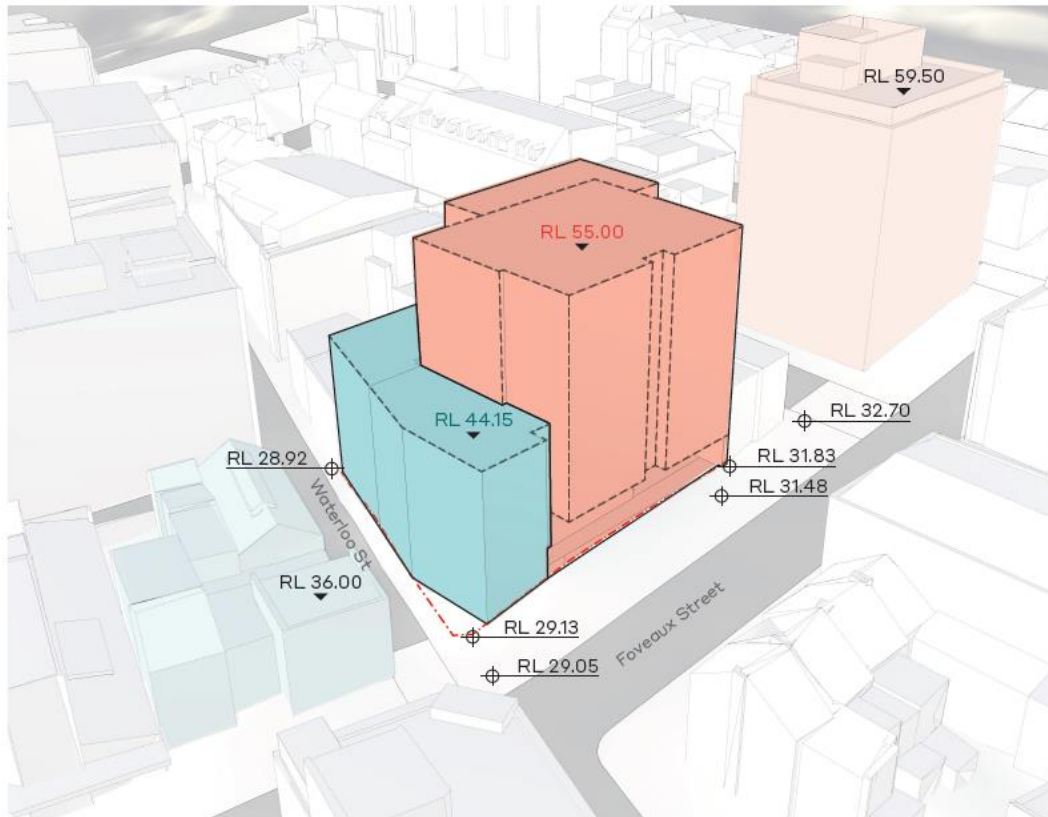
XX: 72-84 Foveaux Street – Maximum building envelope
